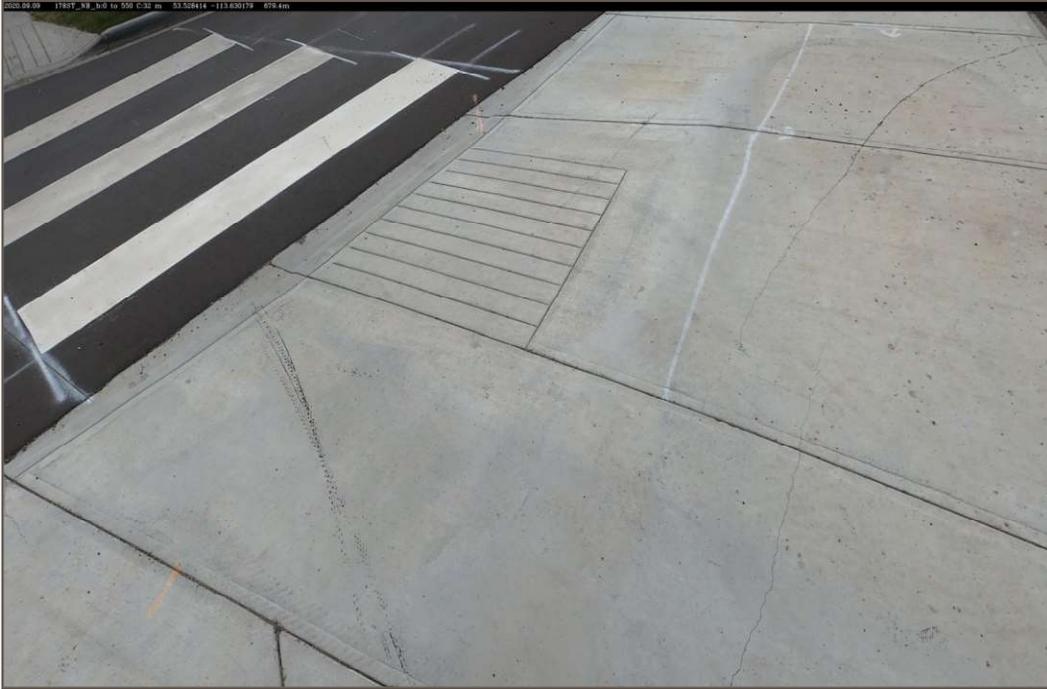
178 Street, August 2020: Recently placed concrete with cracks related to construction.
